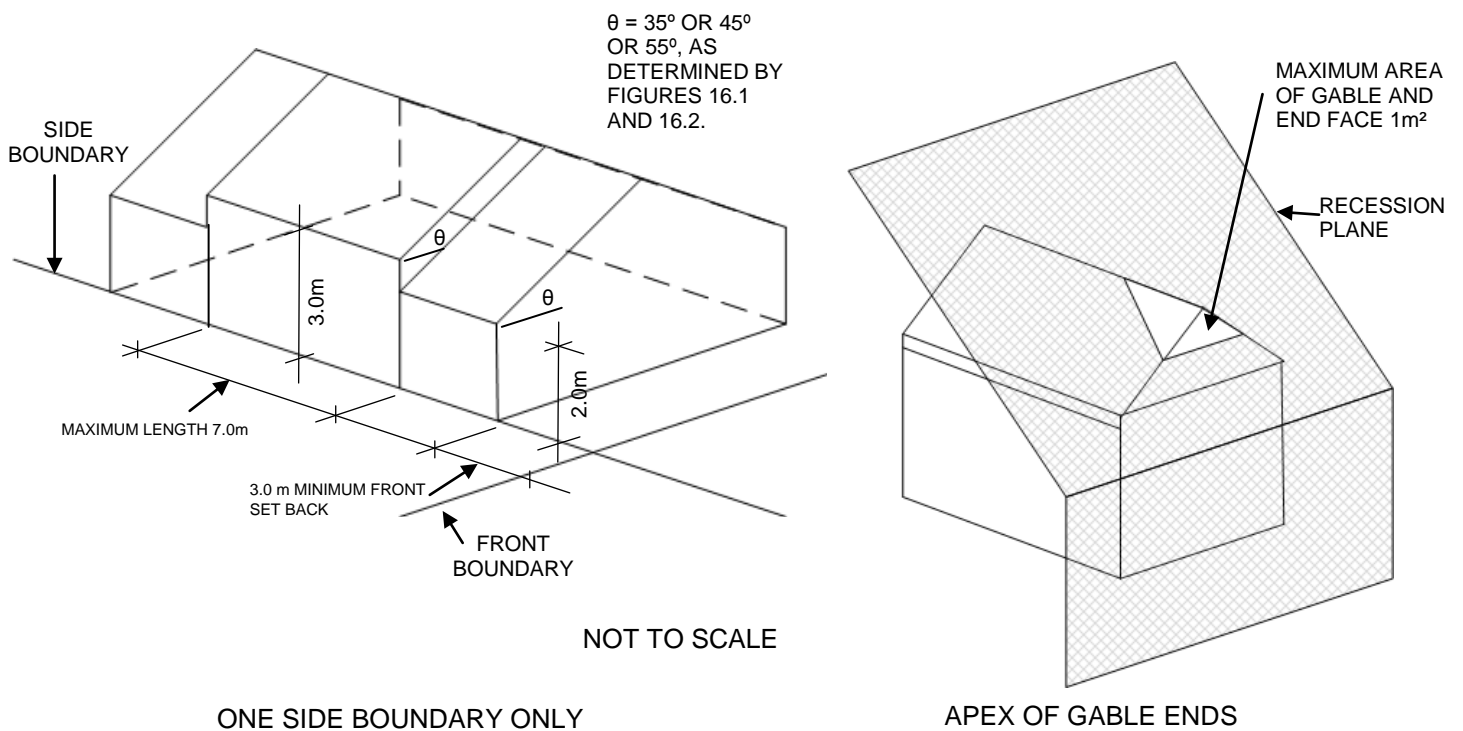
ADDITIONAL ALLOWANCE FOR BUILDING ENVELOPE
